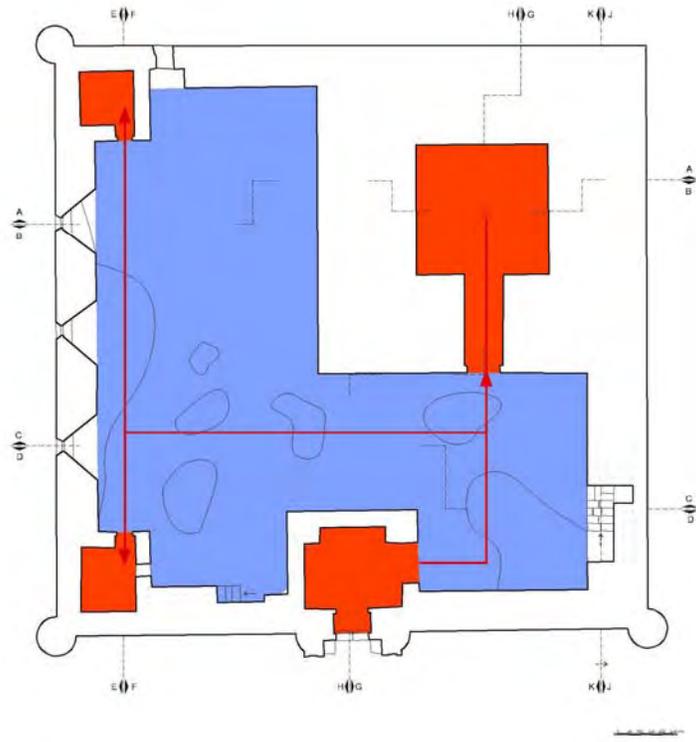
Types of Spaces and Circulation Layout- Ground Floor Plan.
